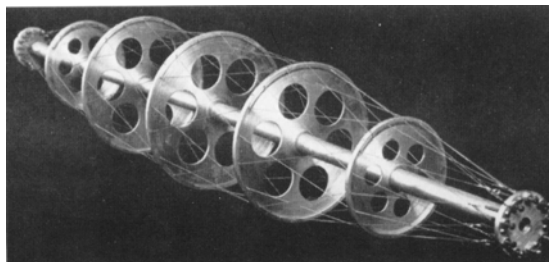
Cable reinforced column design by Le Ricolais.
